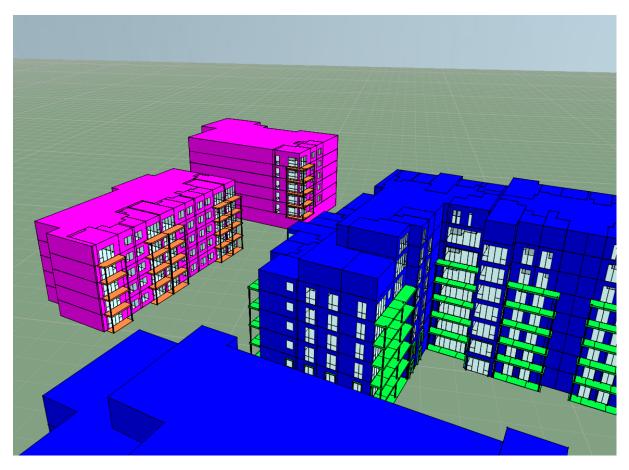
Aerial view of the existing blocks and part of block D (proposed) from southwest
